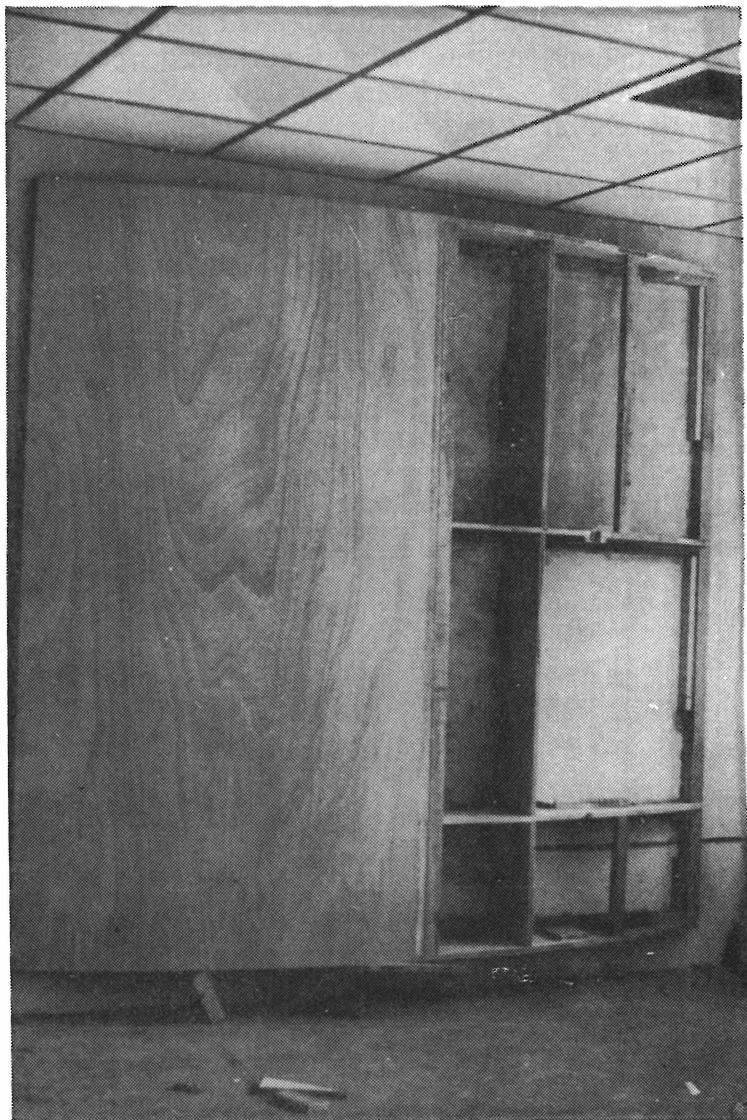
View showing internal structure of curved bulkheads and dividers of semicylindrical unit on south wall.
